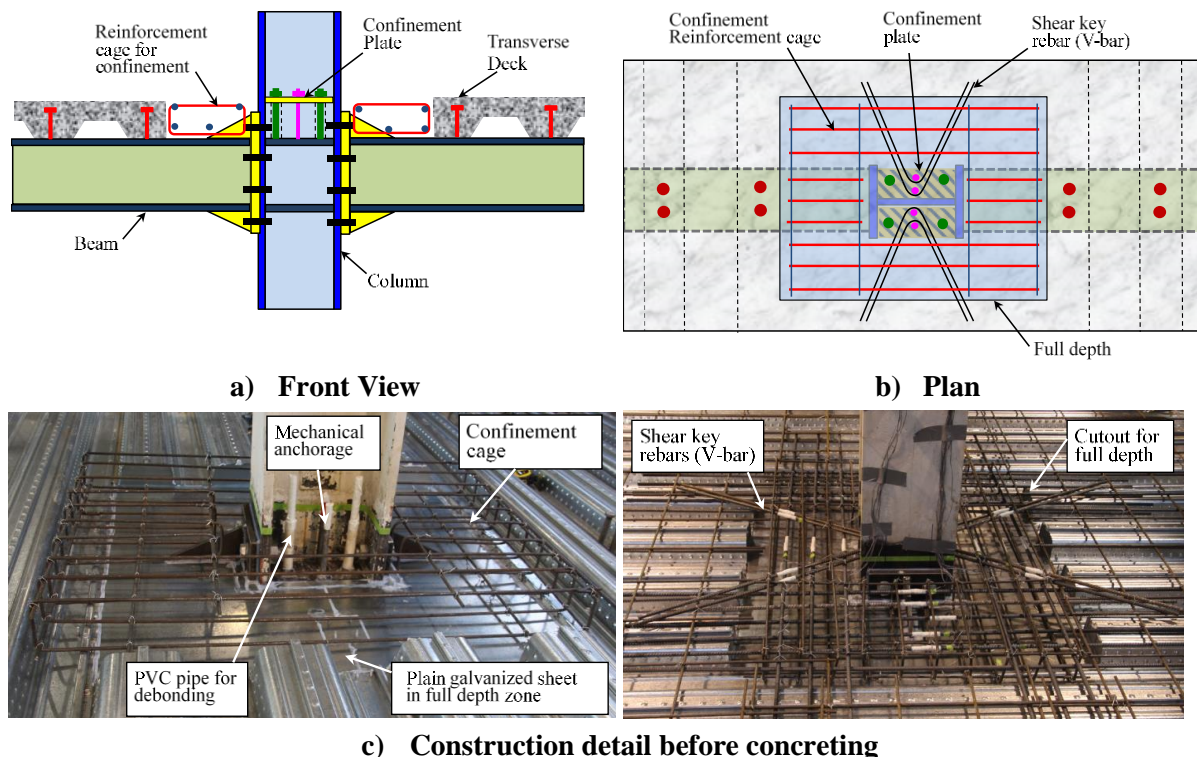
Full Depth Slab Unit (FD-SU) Test Sub-assembly.
